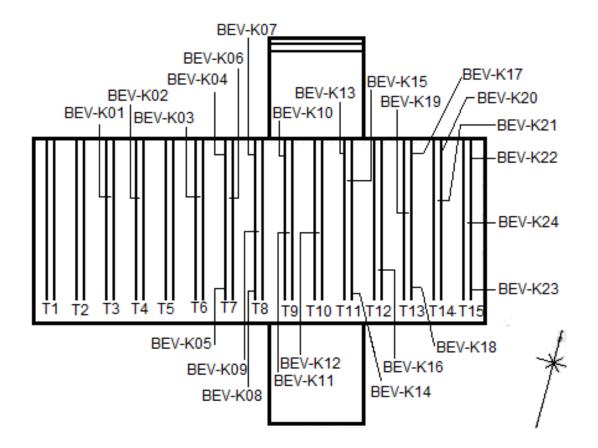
Sketch plan, showing the location of the samples BEV-K01- BEV-K24
